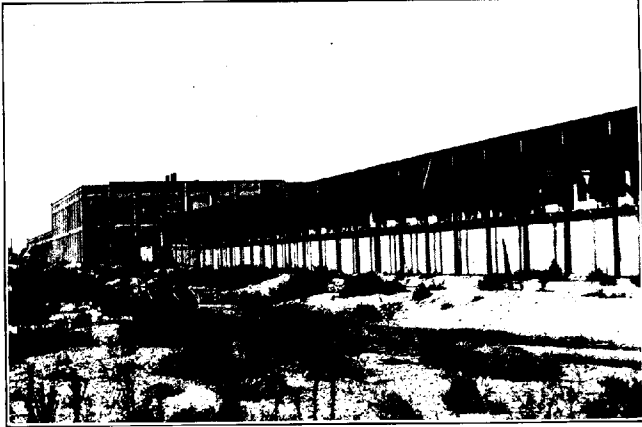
GENERAL VIEW OF ICE-STORAGE BUILDING AND PRECOOLING SHED.
